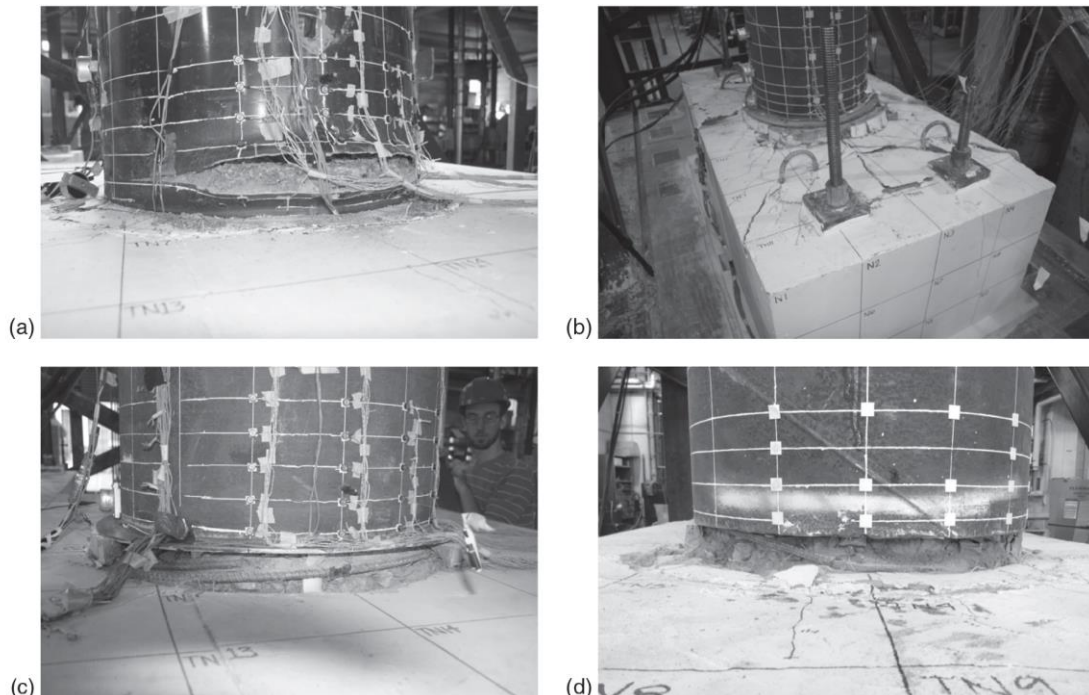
Proposed column to base/ beam connections by Lehman.
